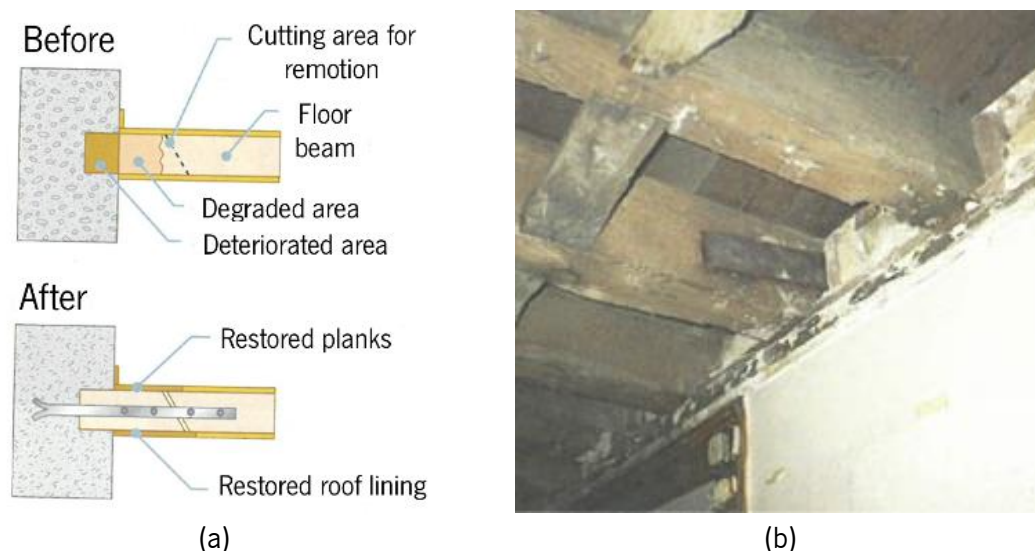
Timber to masonry anchors (Cóias 2007): (a) Replacement of degraded timber joist headpiece; (b) iron strip from the inside.
